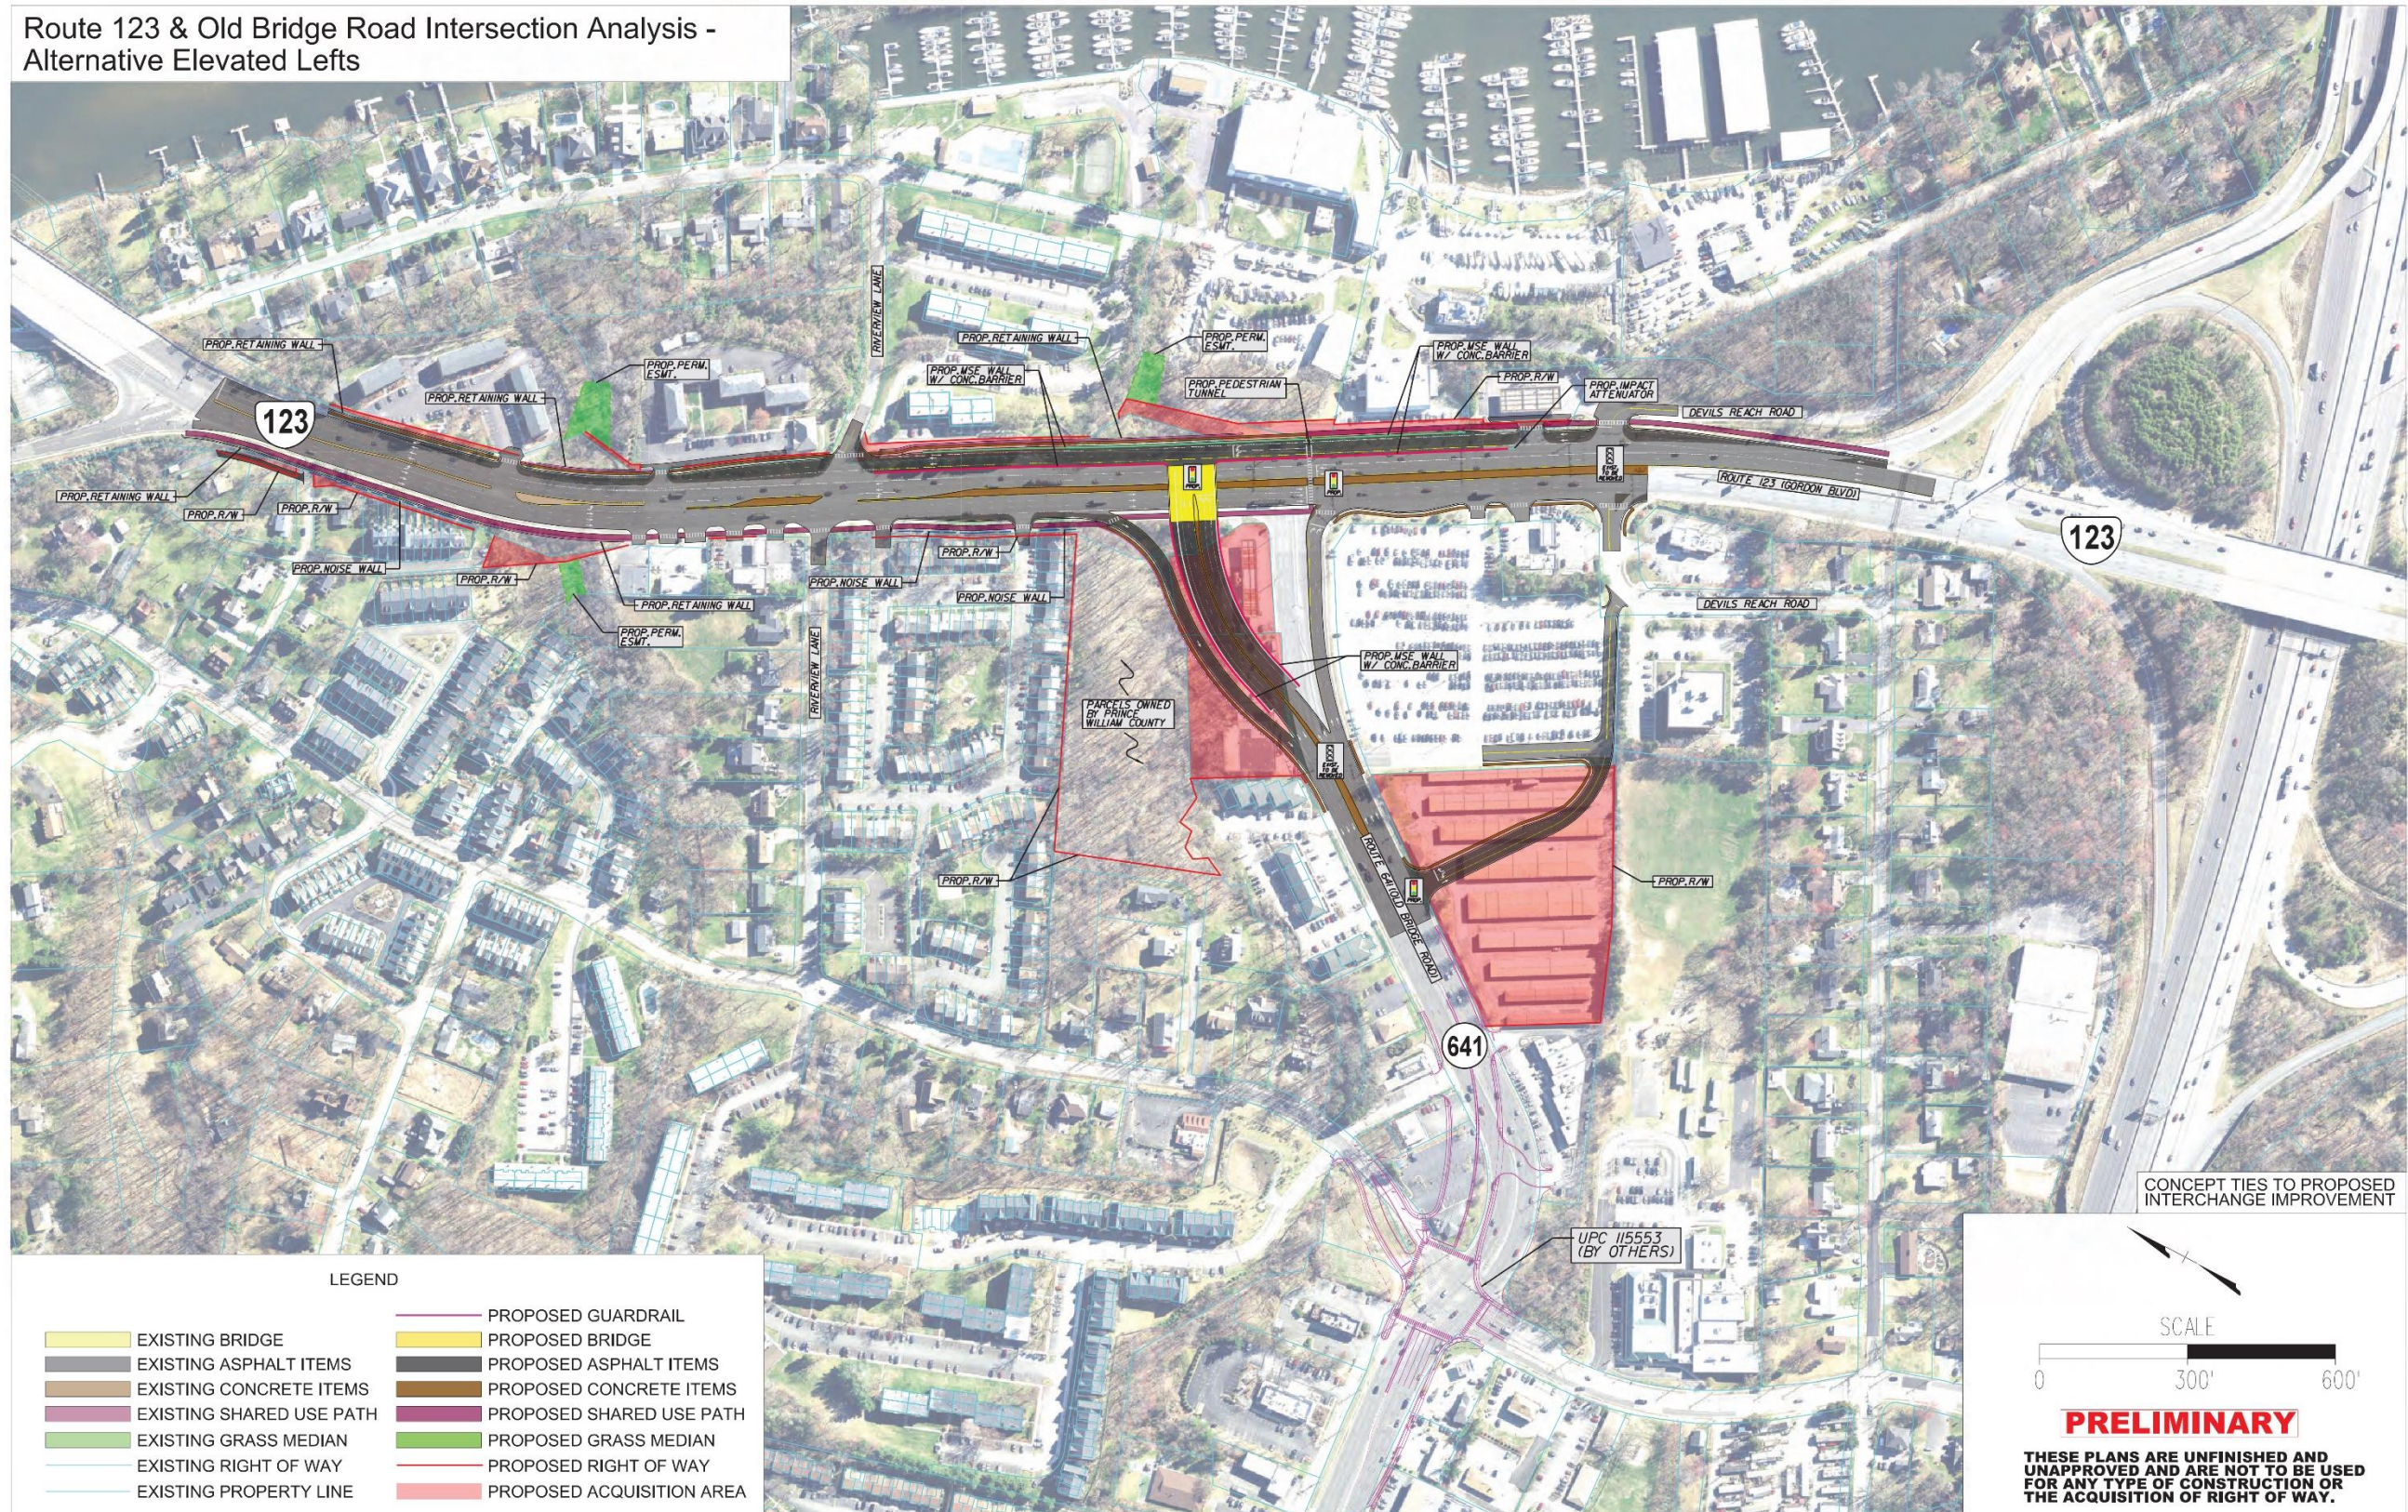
Old Bridge Road Improvement Alternative – Elevated Left Turns
